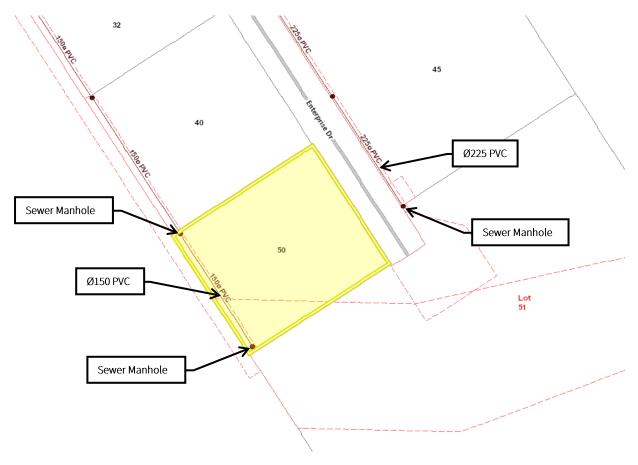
Existing Sewer Infrastructure Around Proposed development site.
